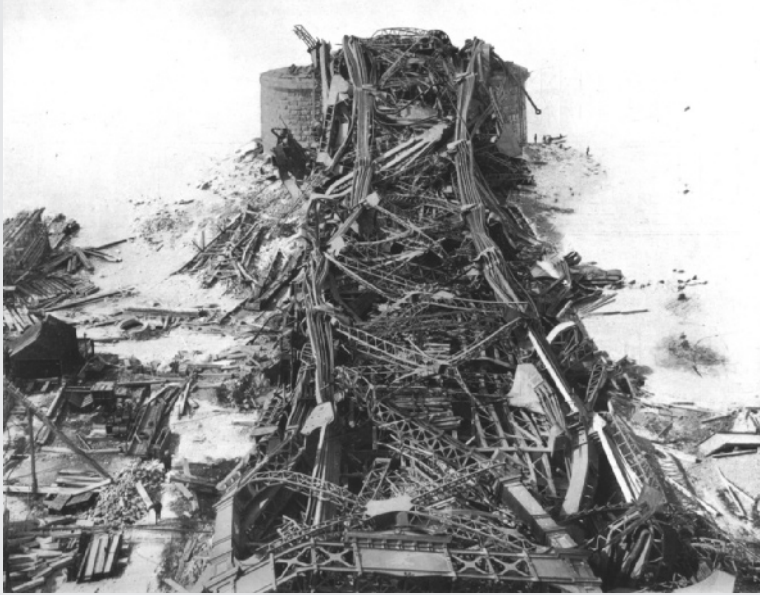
The Quebec Bridge (1907 collapse). *The twisted wreckage of the Quebec Bridge (Phoenix design) stretches out toward the south pier, after the collapse on August 29, 1907.
